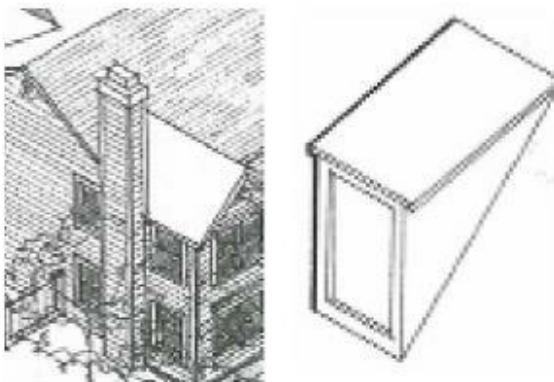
Chimneys and dormers can help to break up the mass of a roof.
